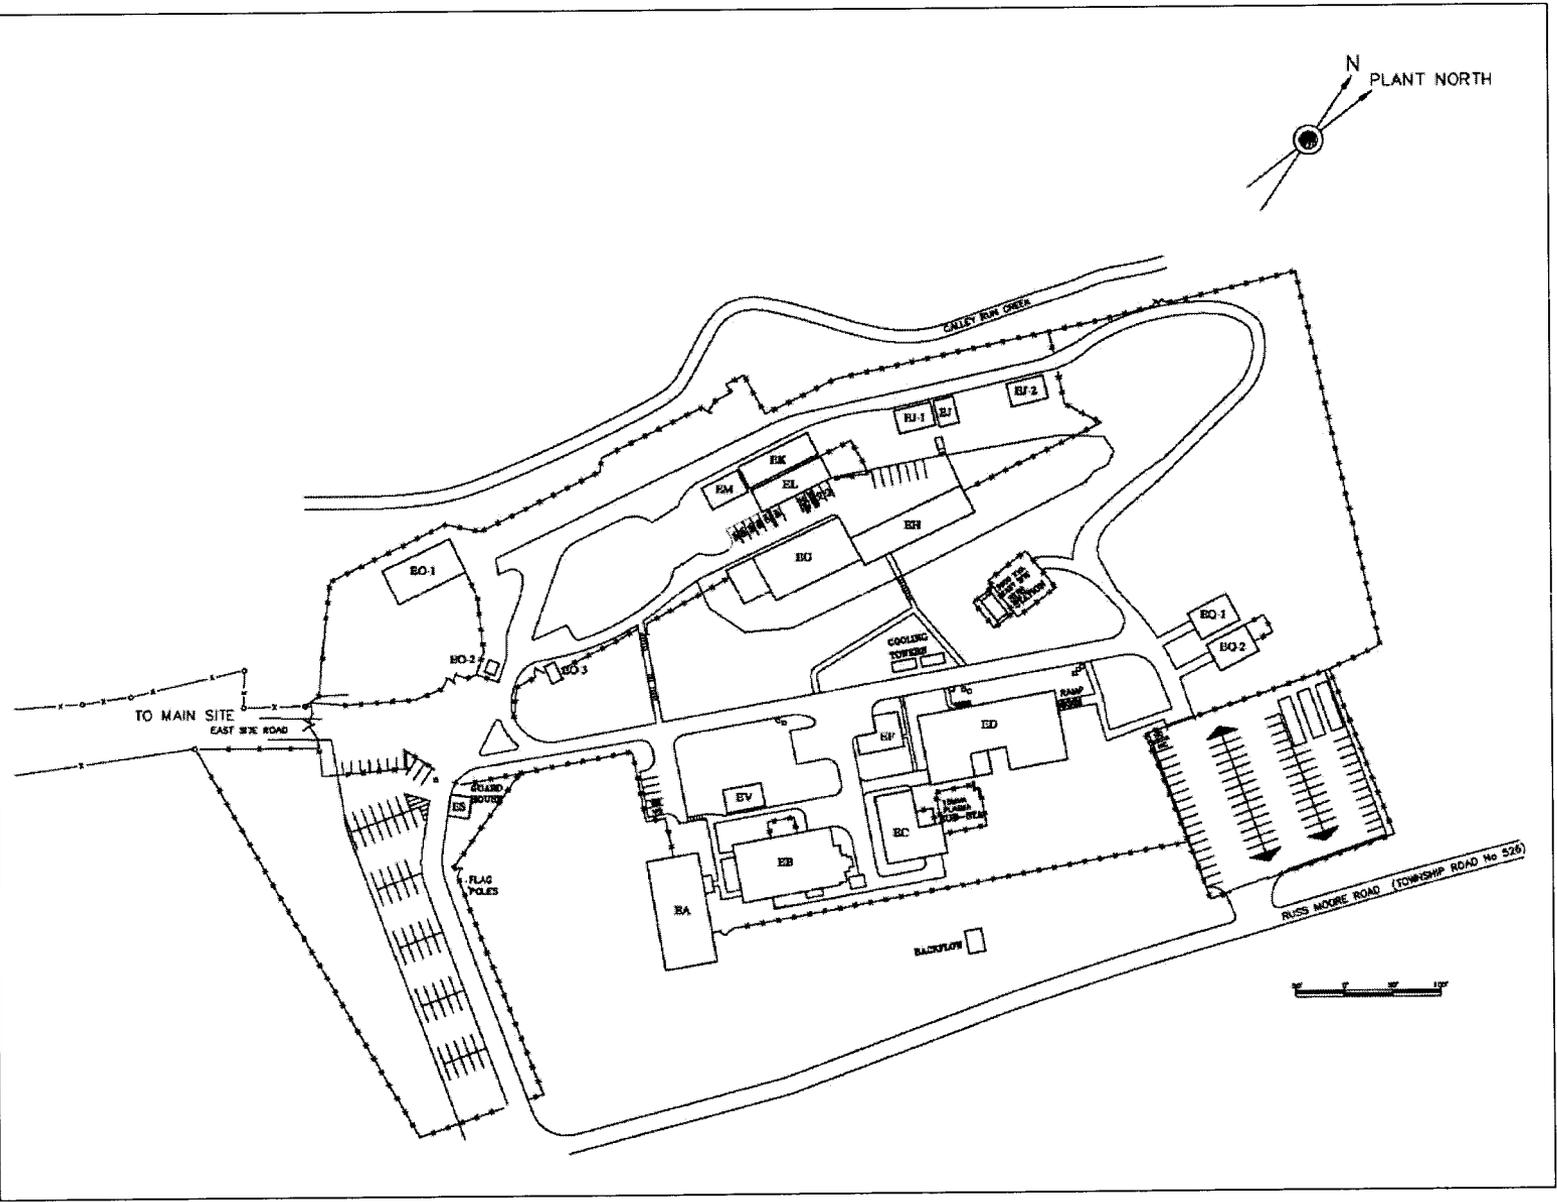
East Site Area and Boundaries and Building Locations
